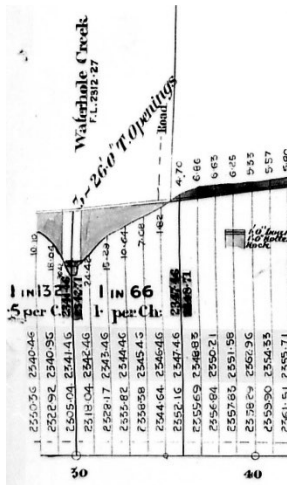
A detail from the Working Plan shows the original intention for the bridge to be three 26ft timber openings.
